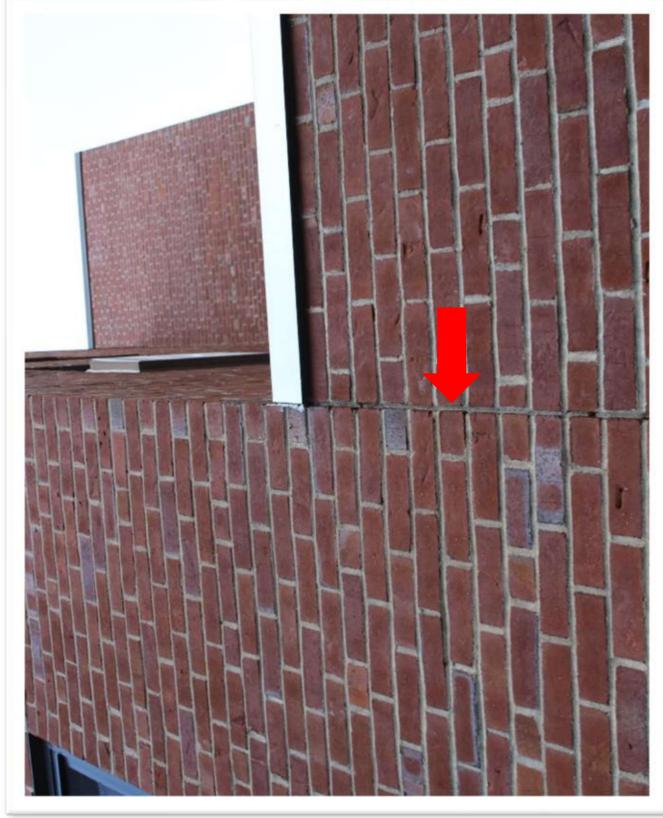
Photo shows defective brick mortar joint at roof parapet wall.
